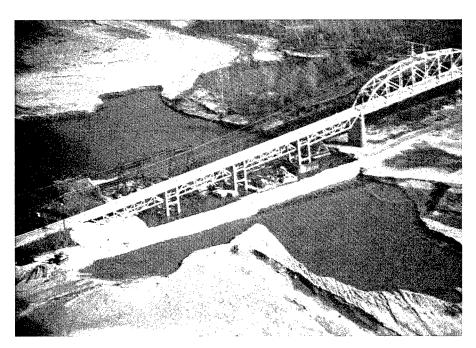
View, looking north, of scour holes and levee breach at west embankment abutment of railroad bridge and Missouri Highway 240 bridge, near Glasgow, Missouri. (Note: fill for repair work in place along downstream side of embankment).
